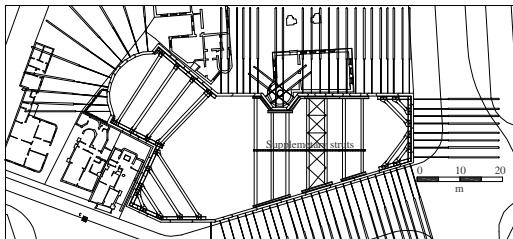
Slurry walls enclosure, sustaining system, anchors and struts
